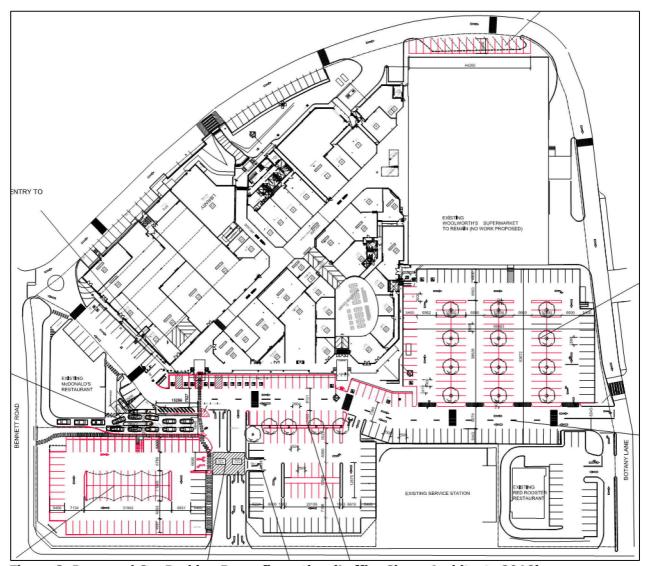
Proposed Car Parking Reconfiguration (Leffler Simes Architects 2018)
